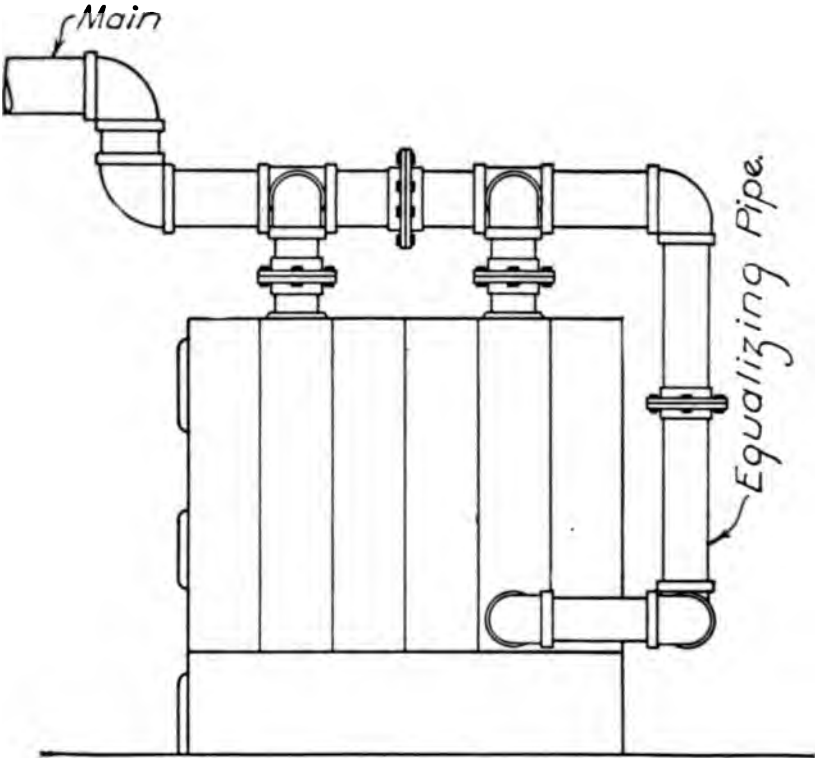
Showing Steam Header on Boiler.—Elevation.
